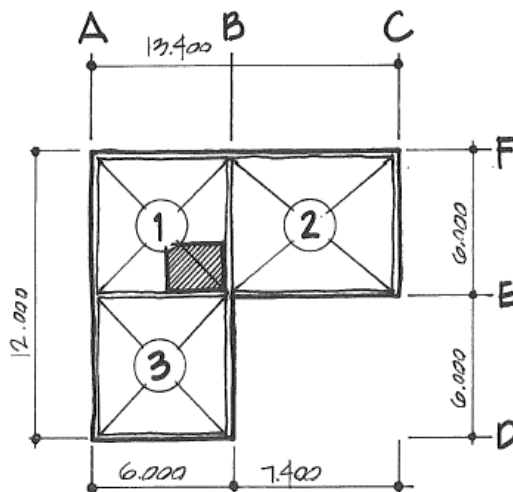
(b): Bracing Lines Diaphragm Positions
